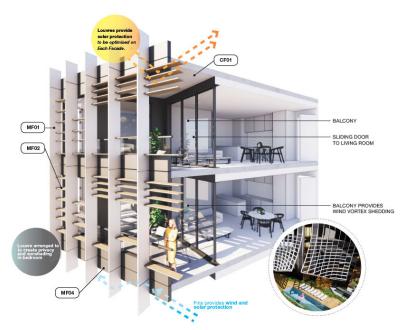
Tower level apartment detail showing proposed balconies (source: application plans prepared by Rothe Lowman)
